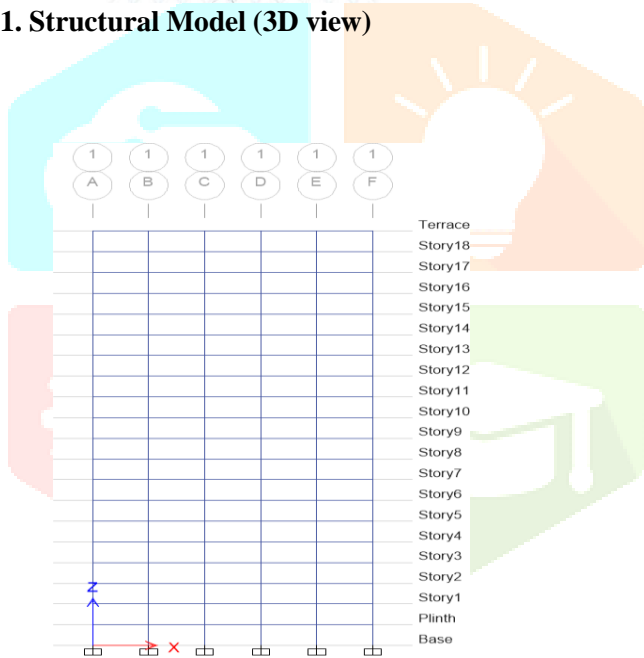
Structural Model (Elevation Along X) without Infill Walls
